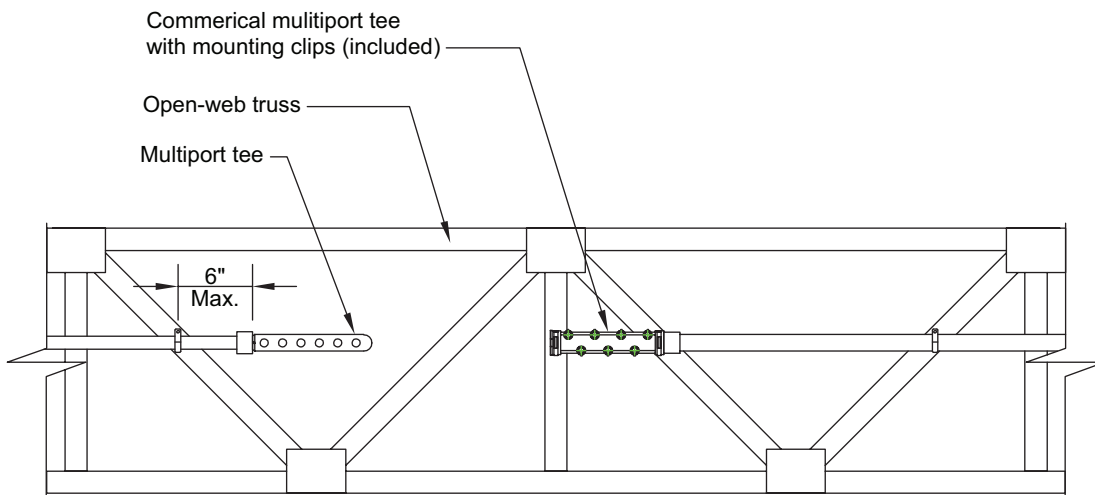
Supporting Multiport Tees on Open-web Wood Trusses
